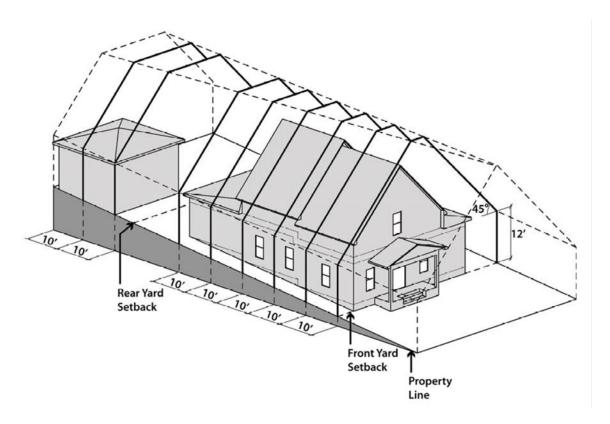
Side Yard Bulk Plane Measurement Using the Parallel Point Method
